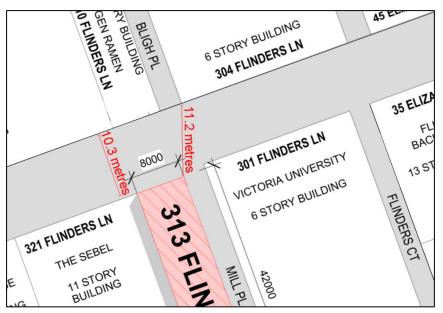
Site Context Plans and proximity to dwellings on the corner of Flinders Lane and Bligh Place (Source: site context plans associated with a building and works application TP-2020-553 associated with the Site)
